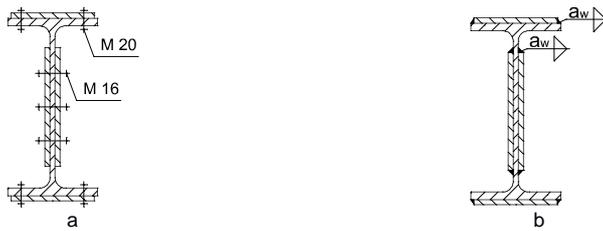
Example for conventionally reinforcements of steel girders with a) screwed and b) welded steel plates
